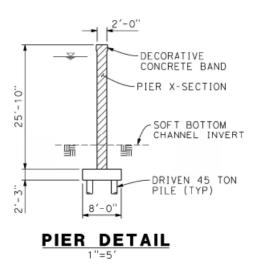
Pier Detail, Proposed Lincoln Boulevard Bridge over the Ballona Creek
